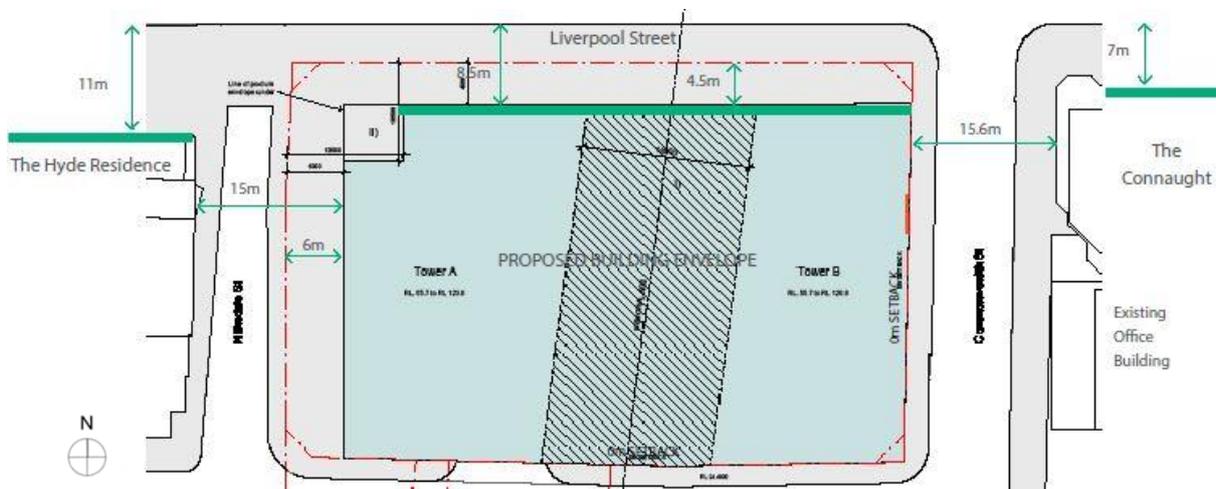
Extract from the 'Revisions to Stage 1 DA - Design Report ' (Crone Architects), identifying the proposed upper level building and street edge setbacks and separation
